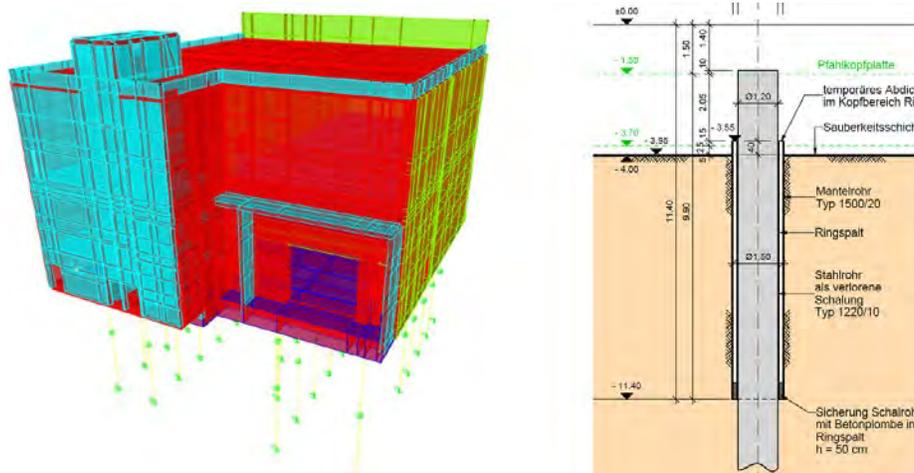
East-Façade perspective view of the 3D FE structural model of ZENT North building (left) and construction detail of a typical steel coated pile from El. -1.50 up to El. -11.40 (right)
